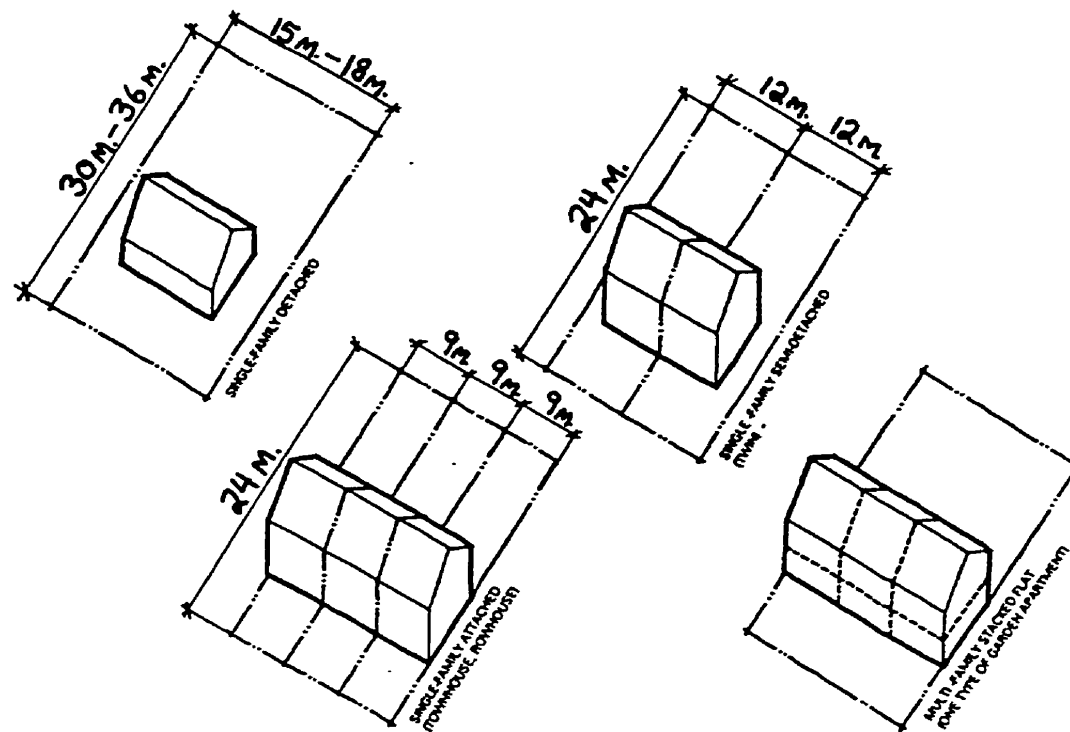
Proposed housing types for the alternative Royalwood plan (drawings are not to scale).
